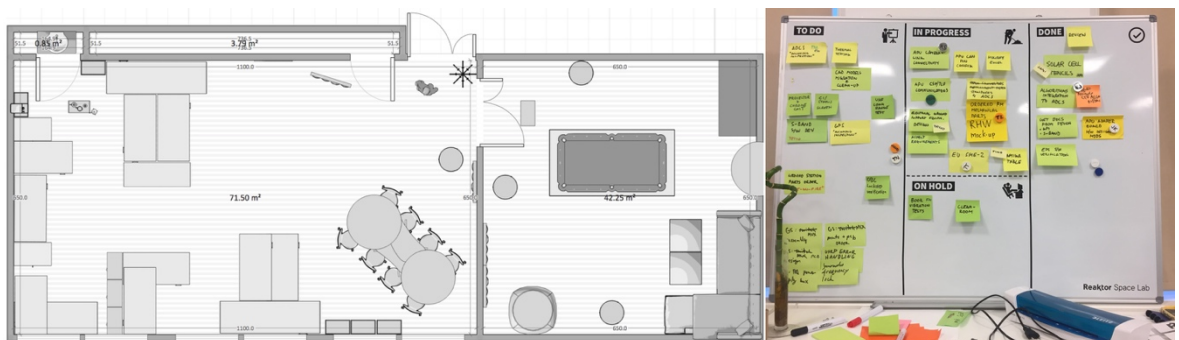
Plan of the new floor layout and a Kanban board for task visualisation
